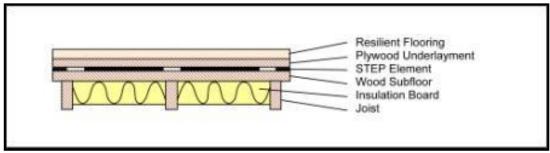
Installing Underfloor Heating Under Marble (http://www.electricunderfloorheatingsystems.com/about-us.html)
